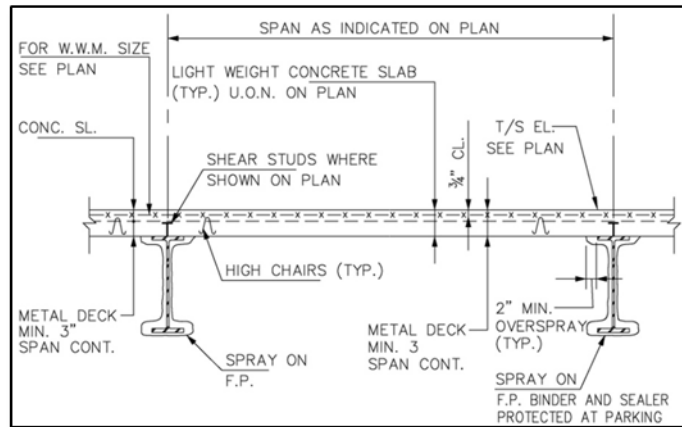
Typical Floor Construction , Metal Deck Perpendicular to Floor Beams on Girders
